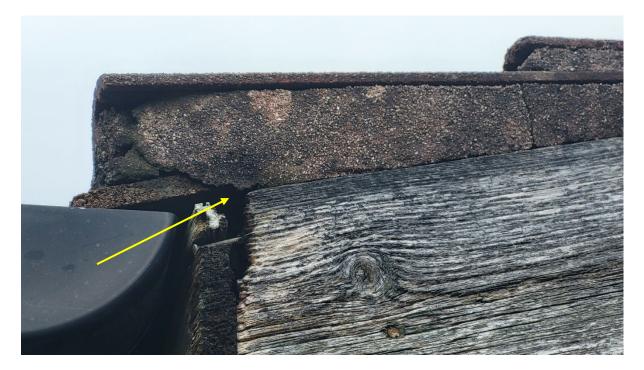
Gap behind fascia on the south-west corner of Racket Town (yellow arrow)
